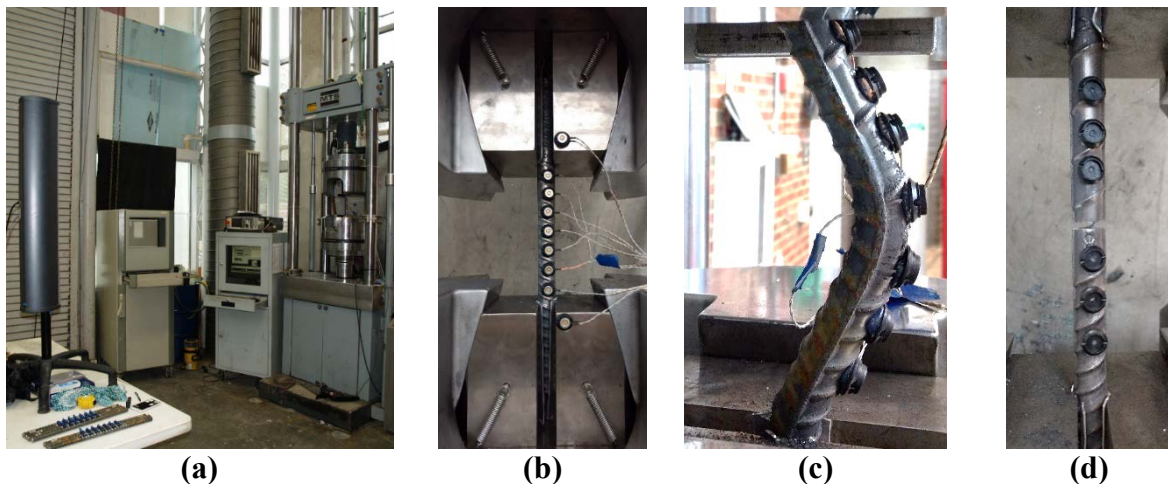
(a) BBT test setup; (b) Rebar specimen with optical markers; (c) Buckled specimen; (d) Fractured specimen
